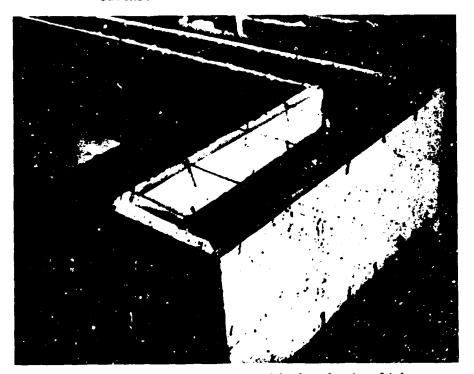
Wood-wool cement board blocks showing light iron "distance pieces" to position blocks
